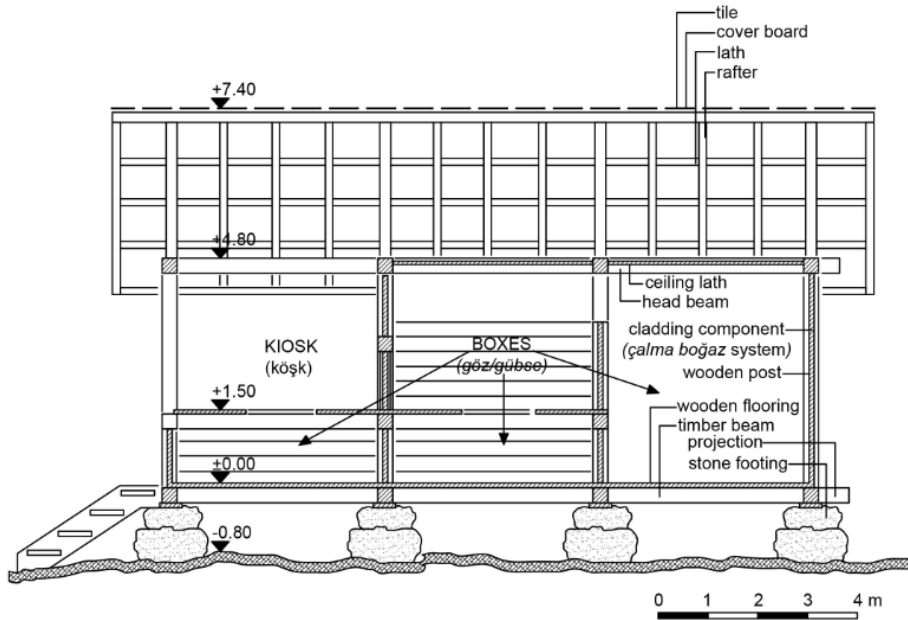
Longitudinal section of plan type with sundurma (porch) (Author)
